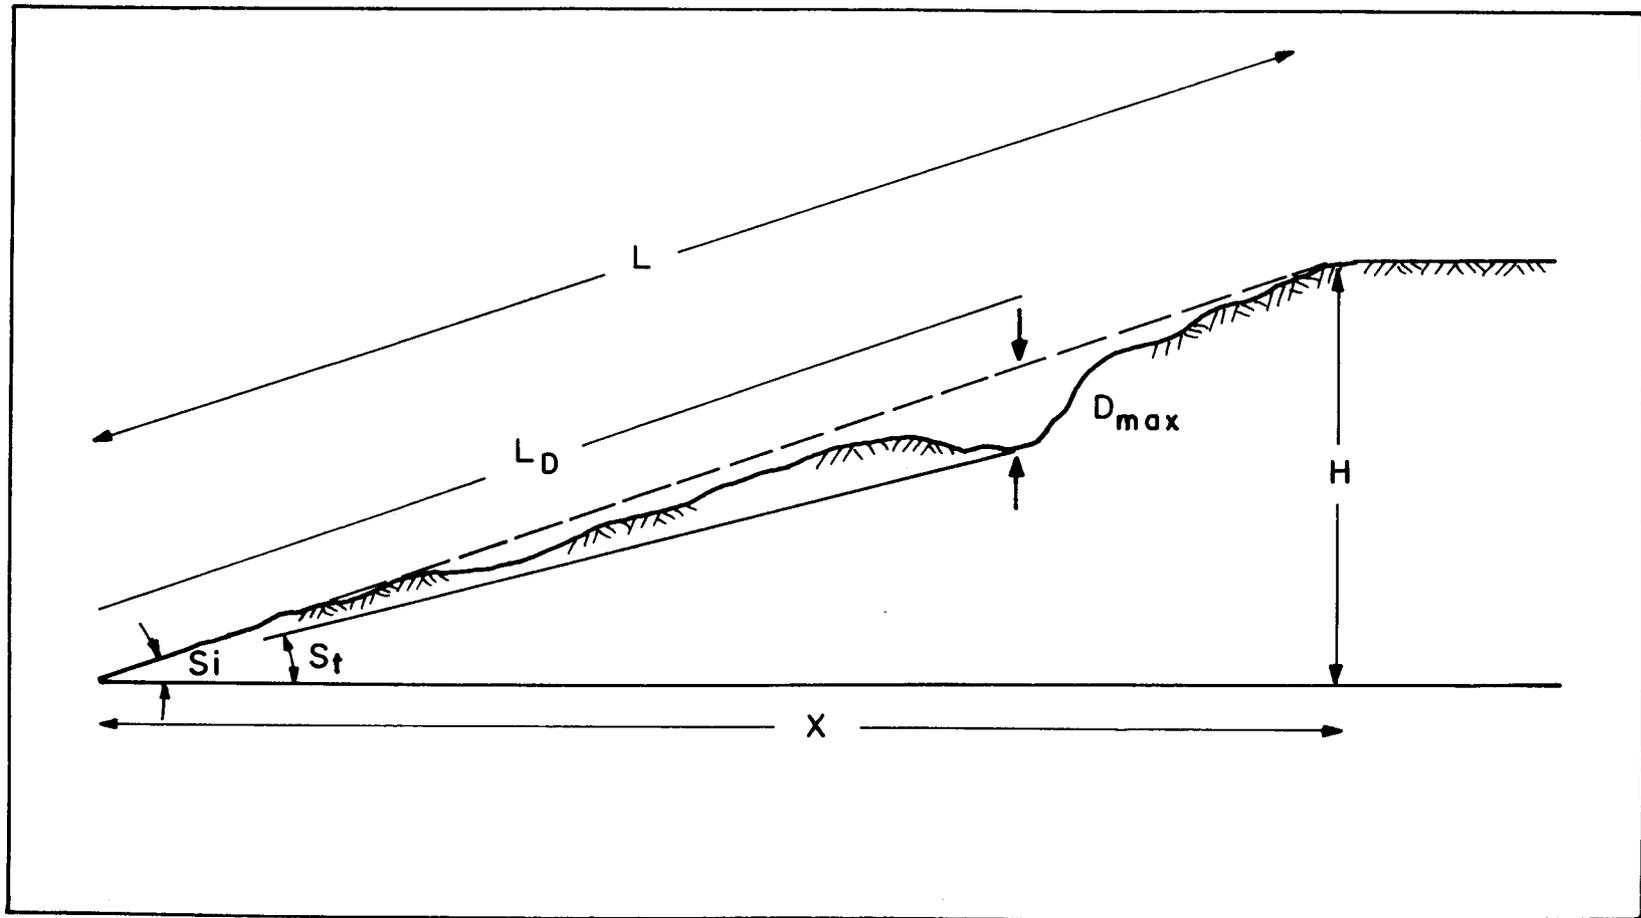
Cross section of a typical reclaimed slope illustrating gully and associated headcut.
